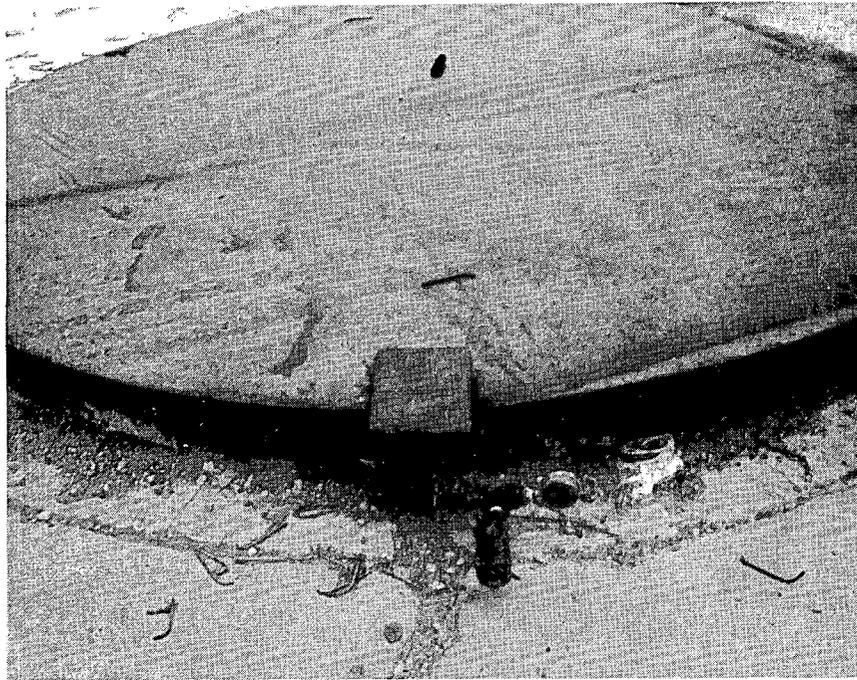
Steel Cover Plate - UC-4 Emplacement Hole
